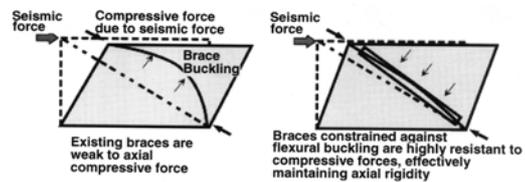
Deformation of existing brace and brace constrained against flexural buckling
